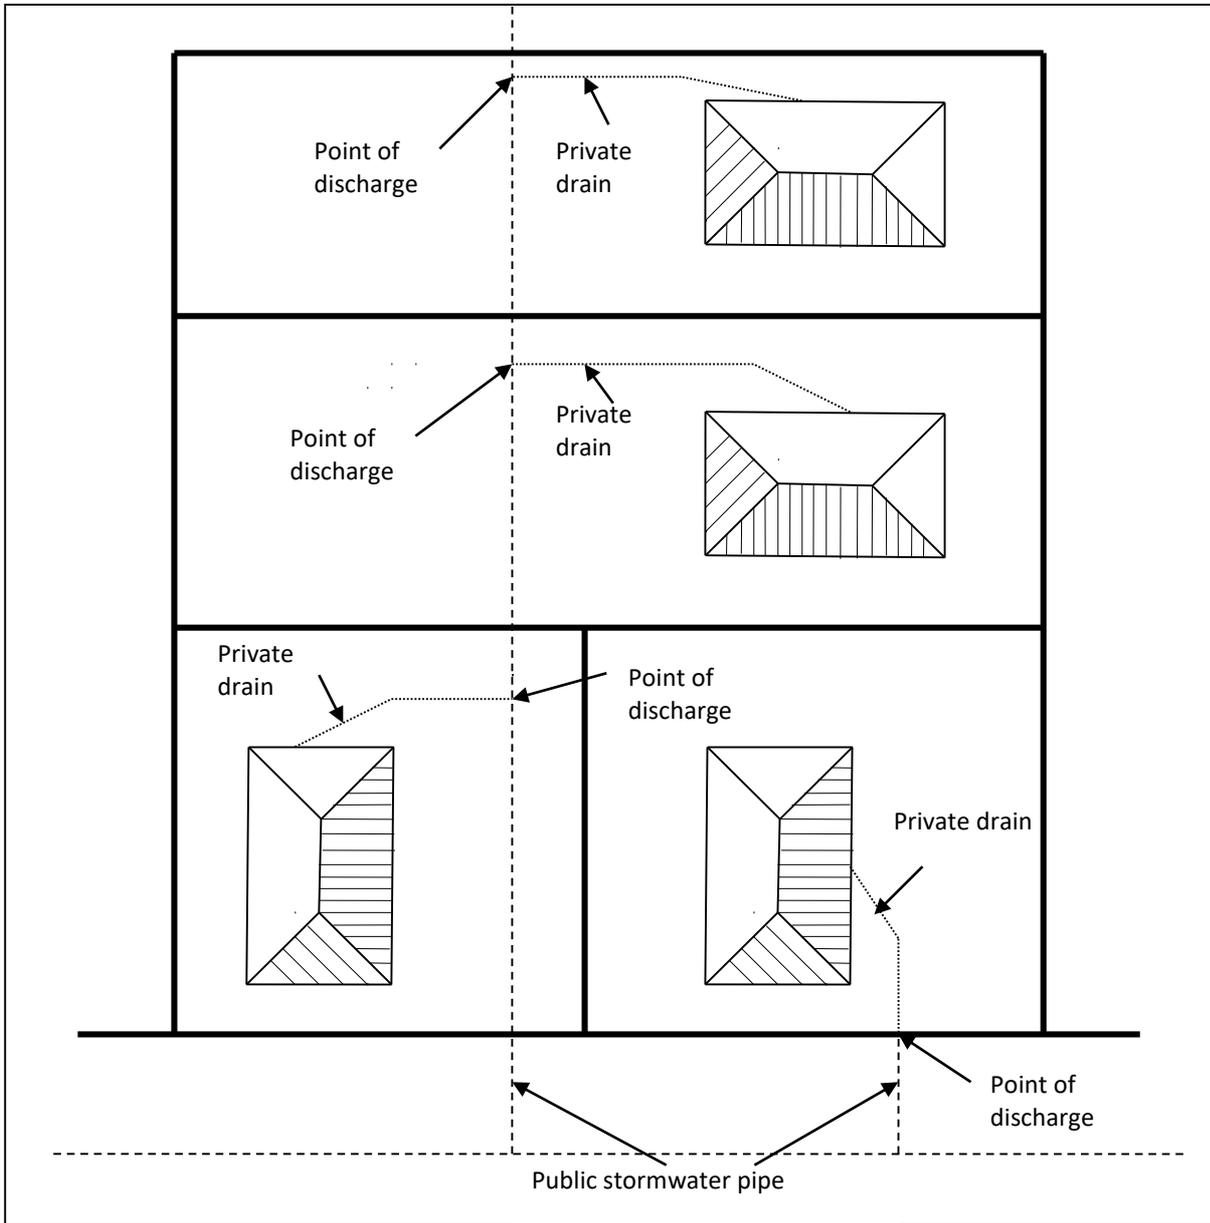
Point of Discharge Location - Public Stormwater Pipe on Private Property
